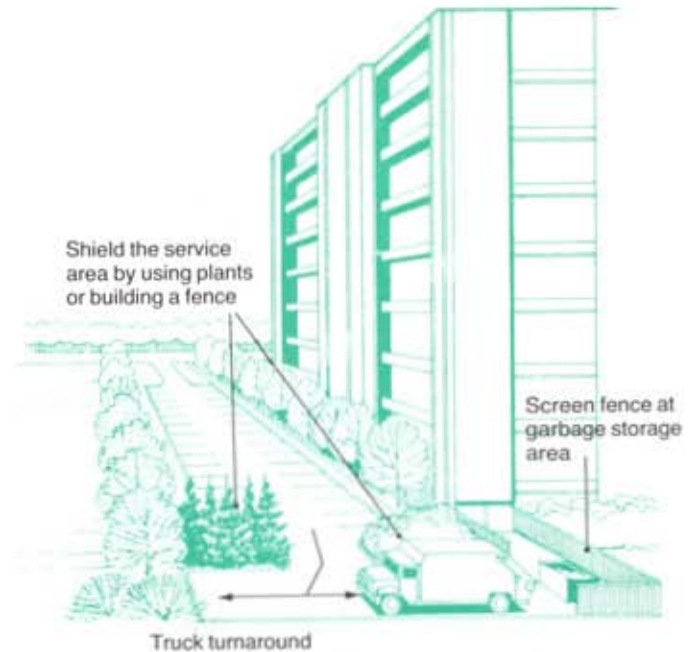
Where possible, garbage collection areas and parking lots should be separated, and adequately screened from housing units.
